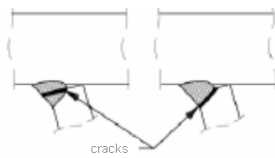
Type 3: connecting trough element to deck plate (Dooren, F. van)
